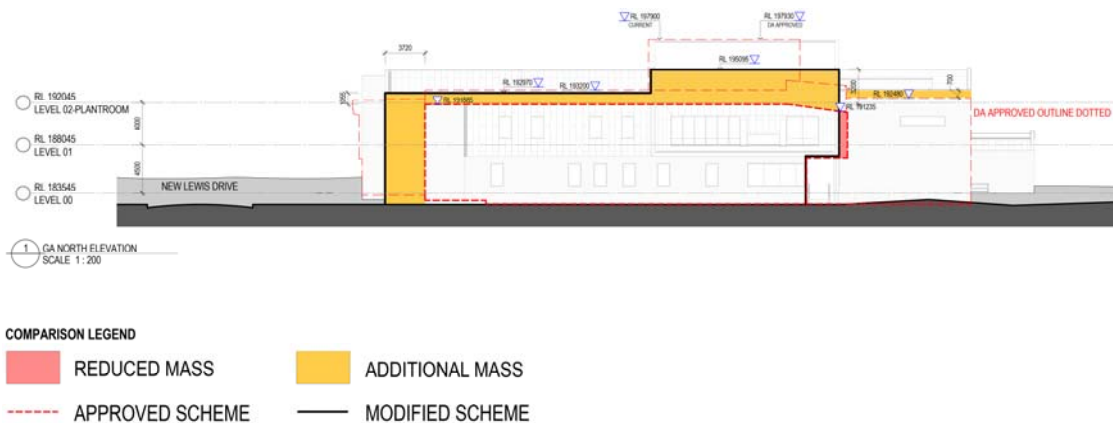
North Elevation comparison drawing (Source: Woods Bagot)
